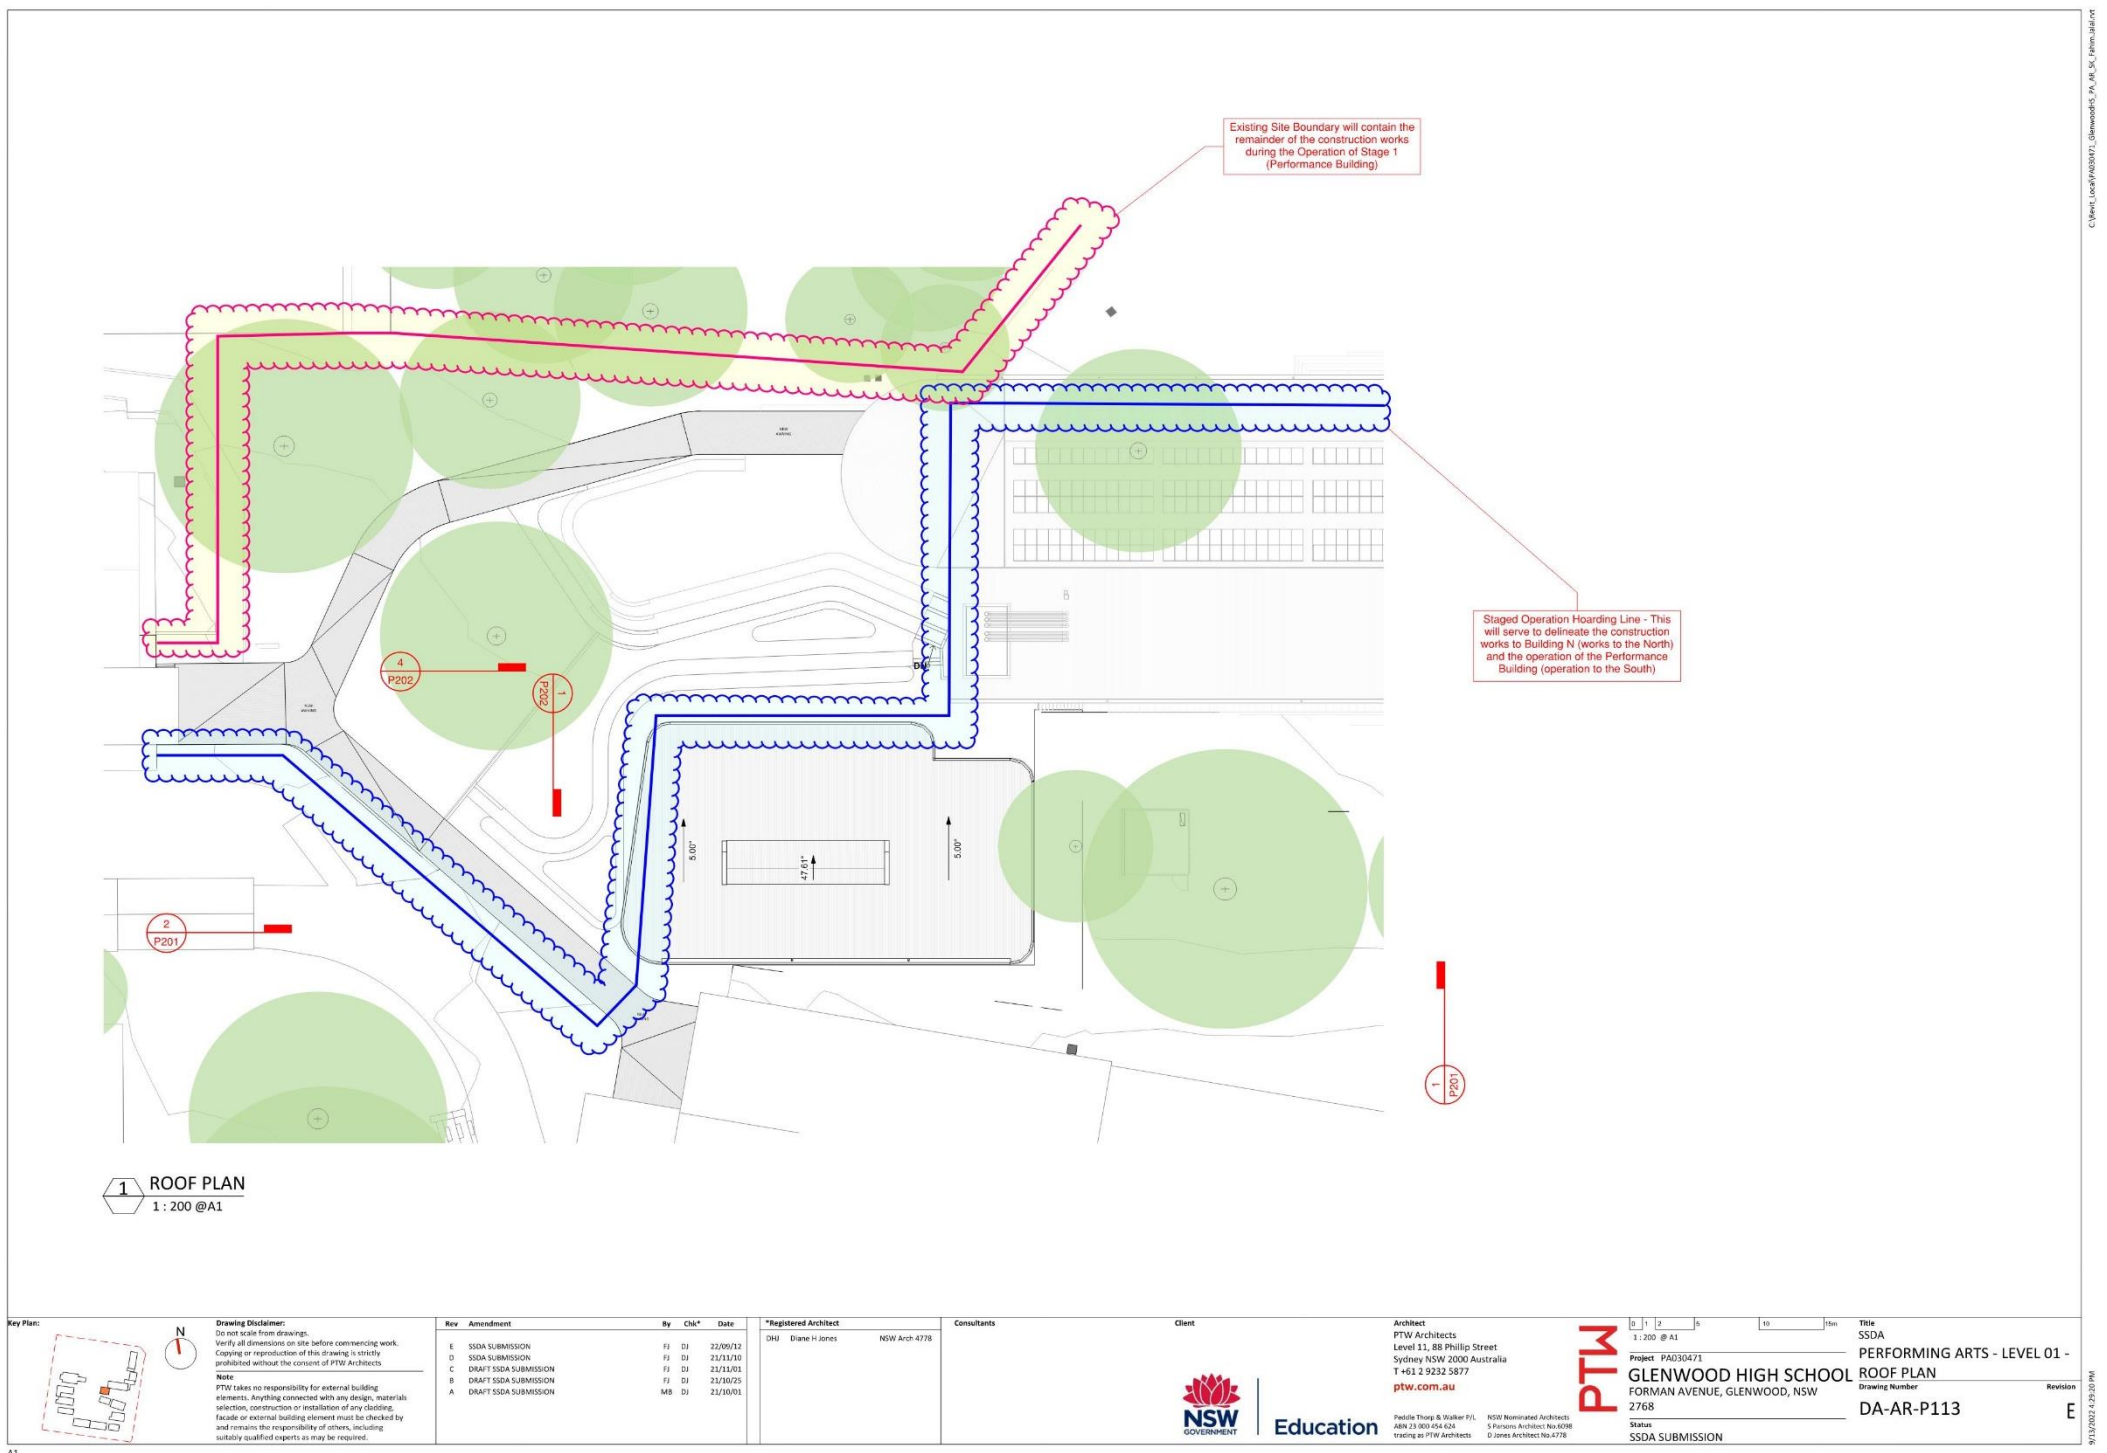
Staged Operation – Project delineation between operational Building M & under-construction Building N (Plan View)
